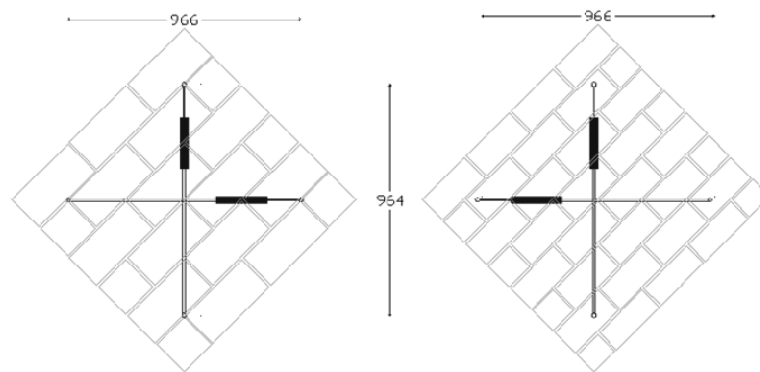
double panel walls layout of sensors on the wall compressed diagonally [mm]
